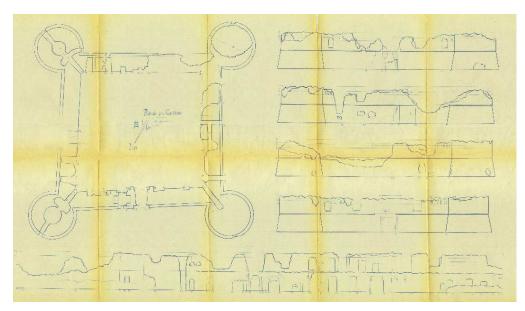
Survey of the castle, with the identification of the collapses of the perimetral walls (Orlandi, 1962, from Historic Archive of Genio Civile, section of L'Aquila, subsection of Avezzano).
